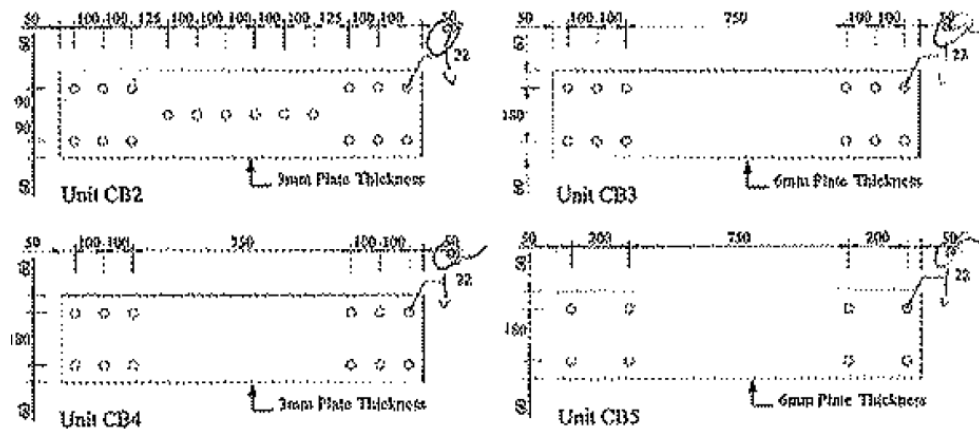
Bolted Side Steel Plate Beams Detailing (Zhu, et al., 2007).
